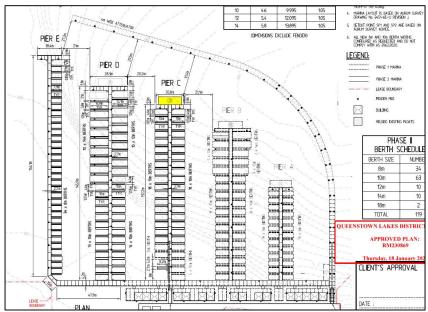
Council approved plan showing location of an 18m berth at the end of Pier C
